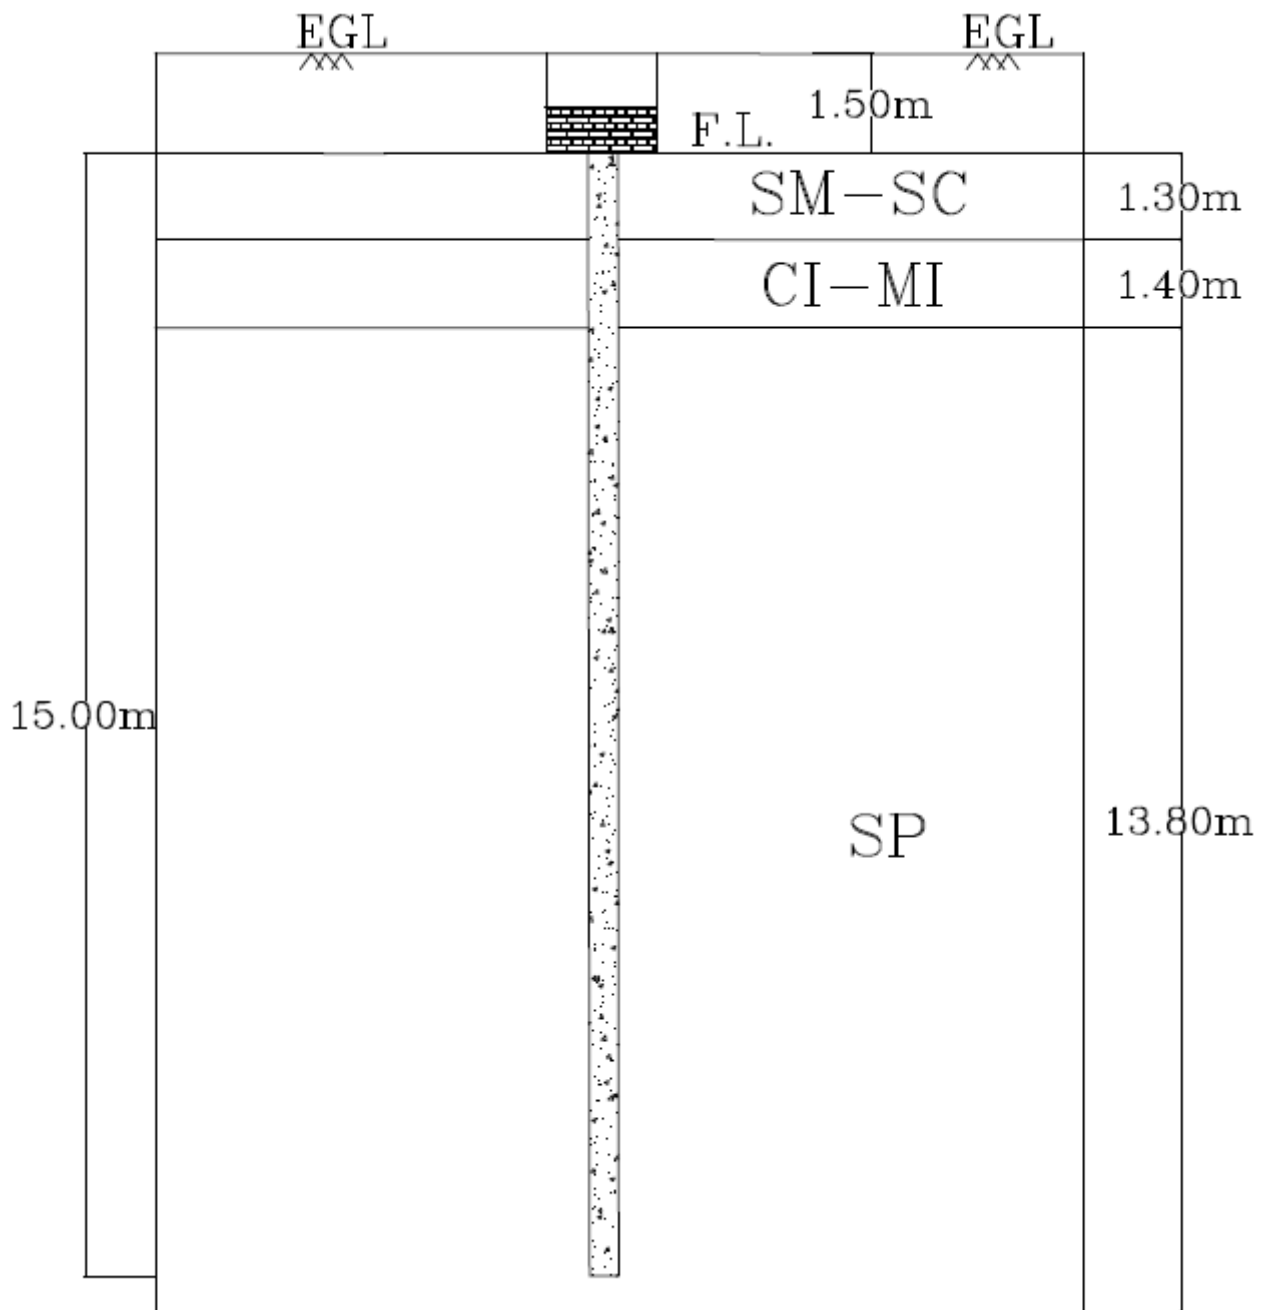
Pile foundation at the cut off 1.50 m below EGL
